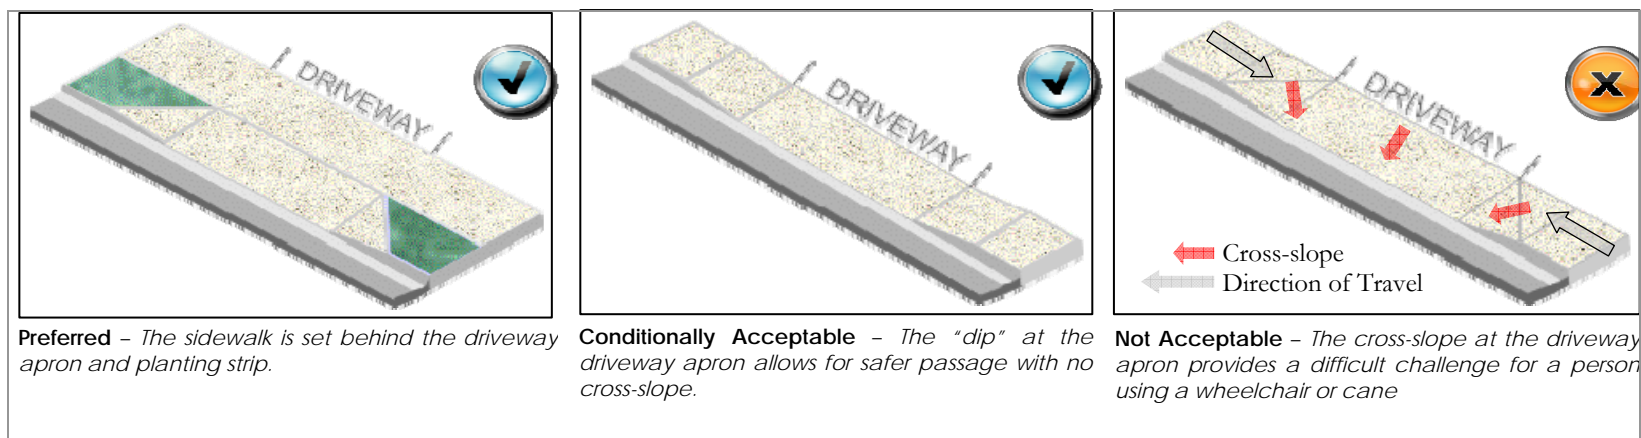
Examples of acceptable and unacceptable design solutions for minimizing cross-sloping at a driveway-sidewalk interface.
